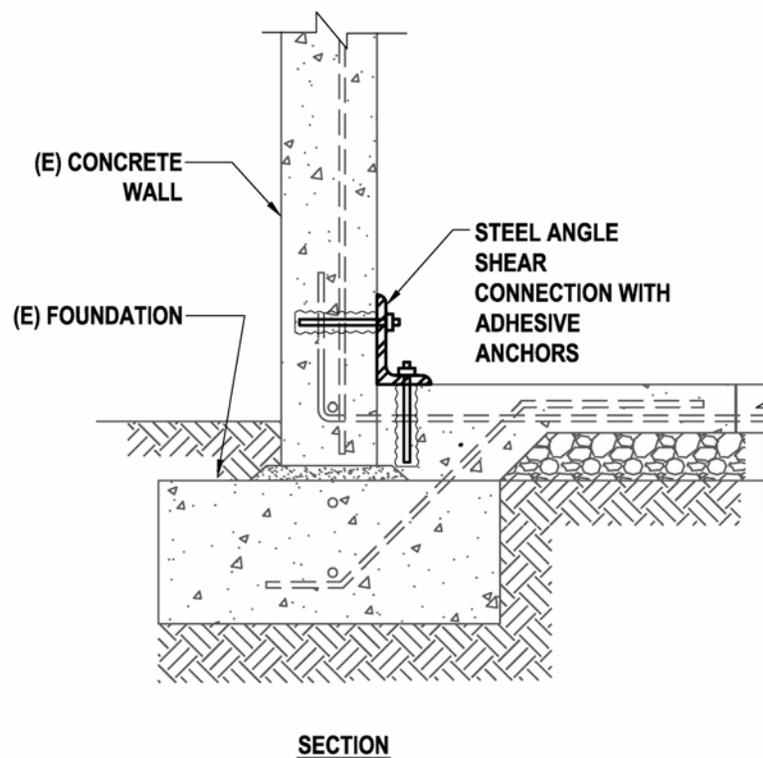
Enhancement of Tilt-up Panel Base Connection
